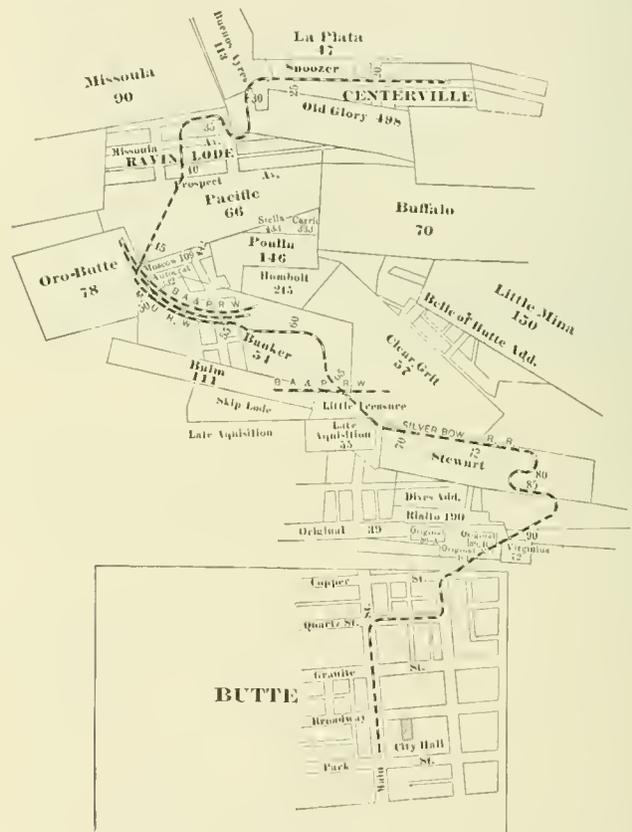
PLAN OF SILVER BOW RAILROAD.
